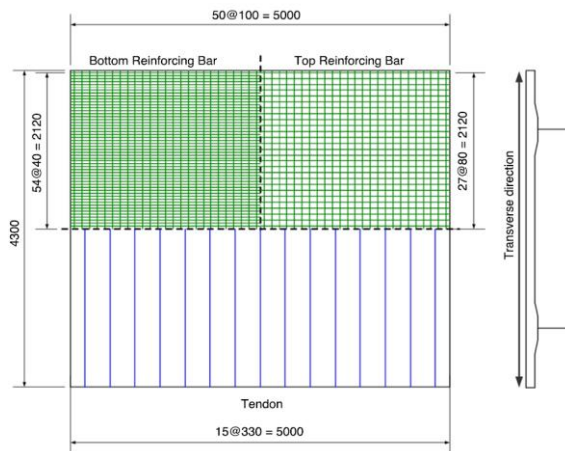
Geometry and reinforcement layout of the specimens [7]
